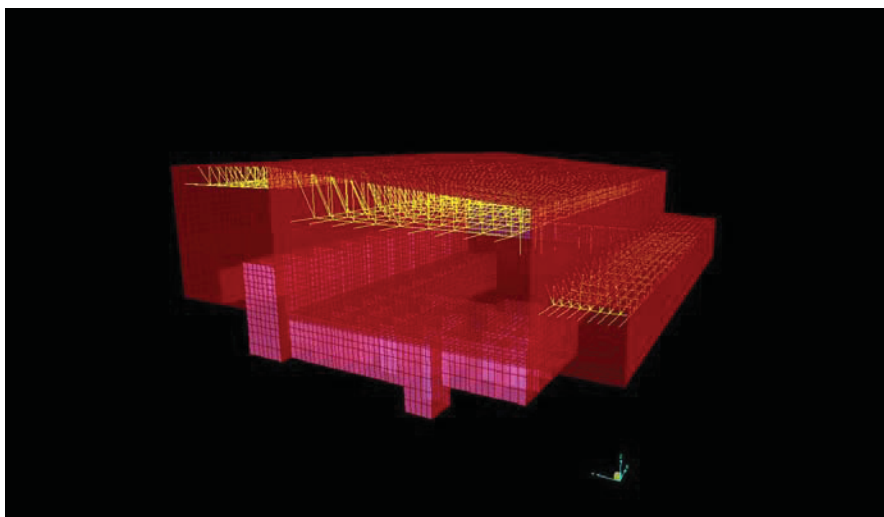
3D View w/ Exterior Wall Removed 1
